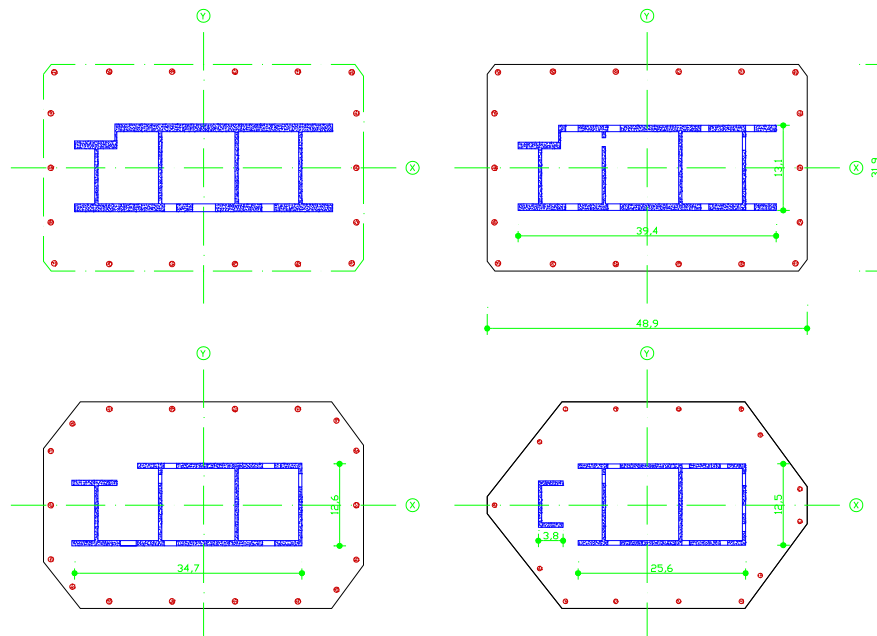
Typical floor plan of basement, low-, mid- and high-rise section
